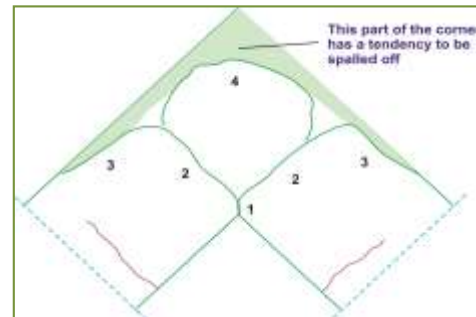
Schematic Cracking Pattern in an Opening Corner for U-type Detailing (Johansson, 2001)
